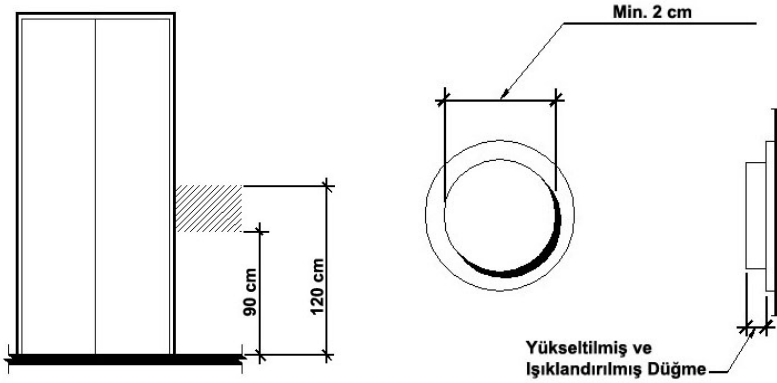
Outer Panel Height of Elevator and Control Panel Buton [22]
